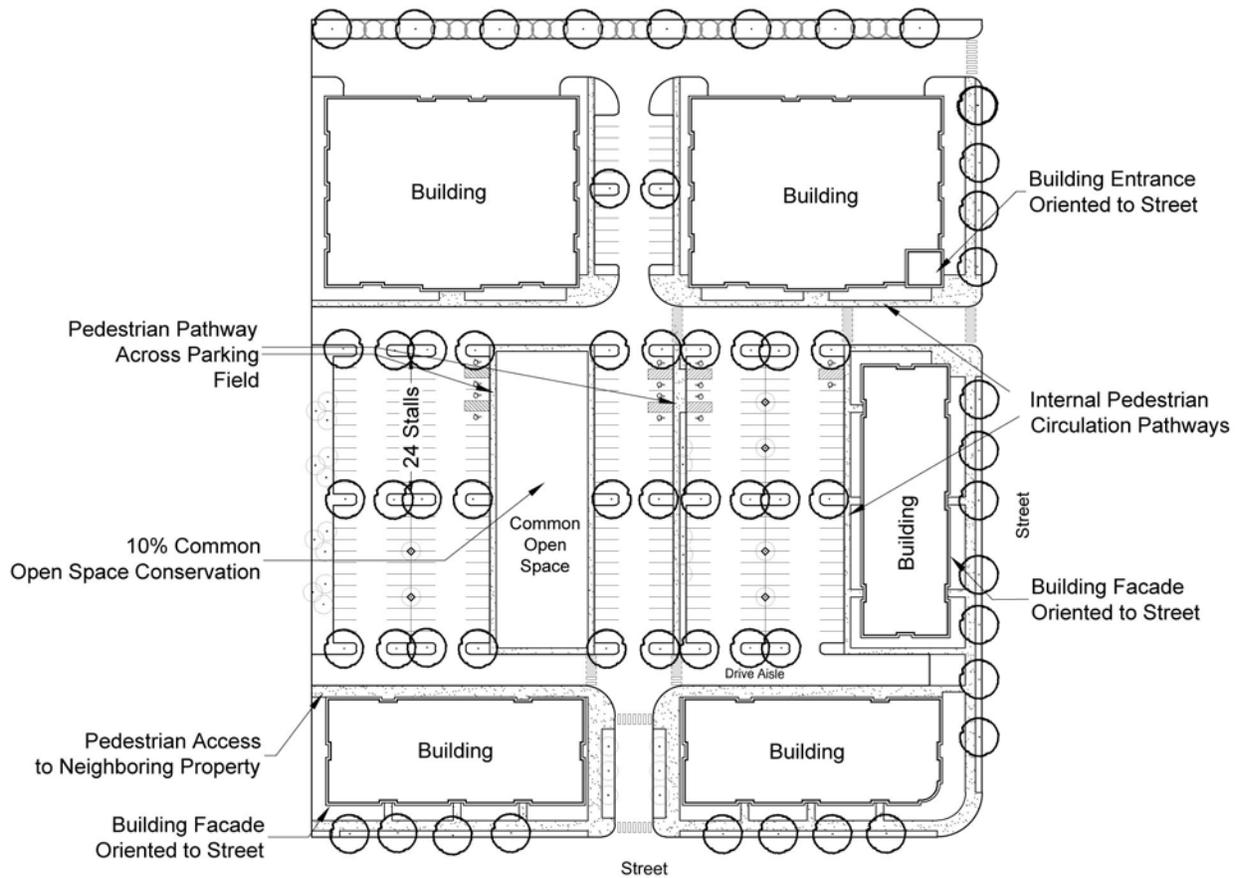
(d). – Site Layout – Pedestrian Standards
